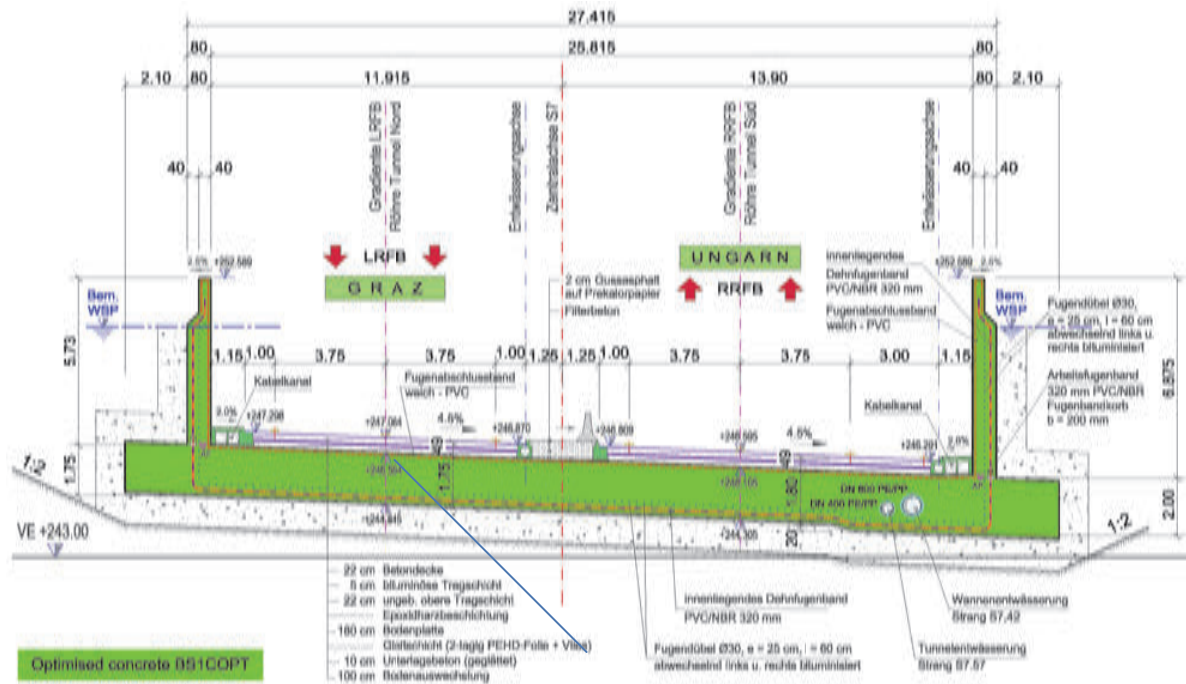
Cross section S7.24b - block joint B35/36 km 11+244,000
